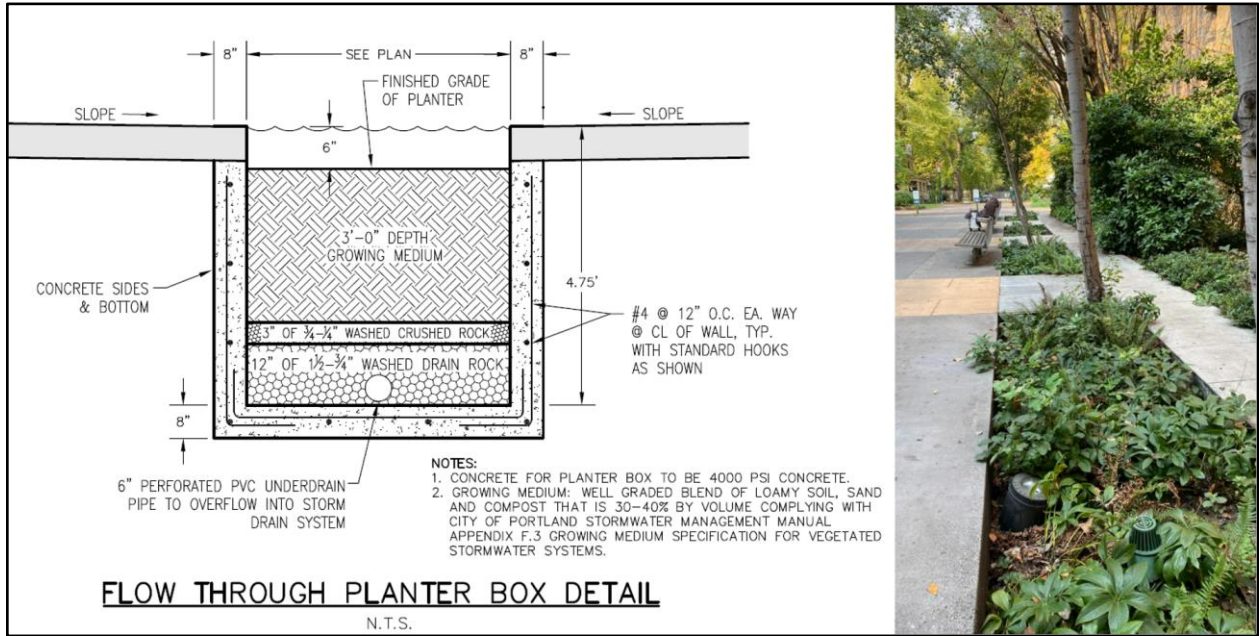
Flow-Through Planters details. PSU Cramer Hall (North Plaza Plan Street Cross Sections C2 6/5/2009.)
